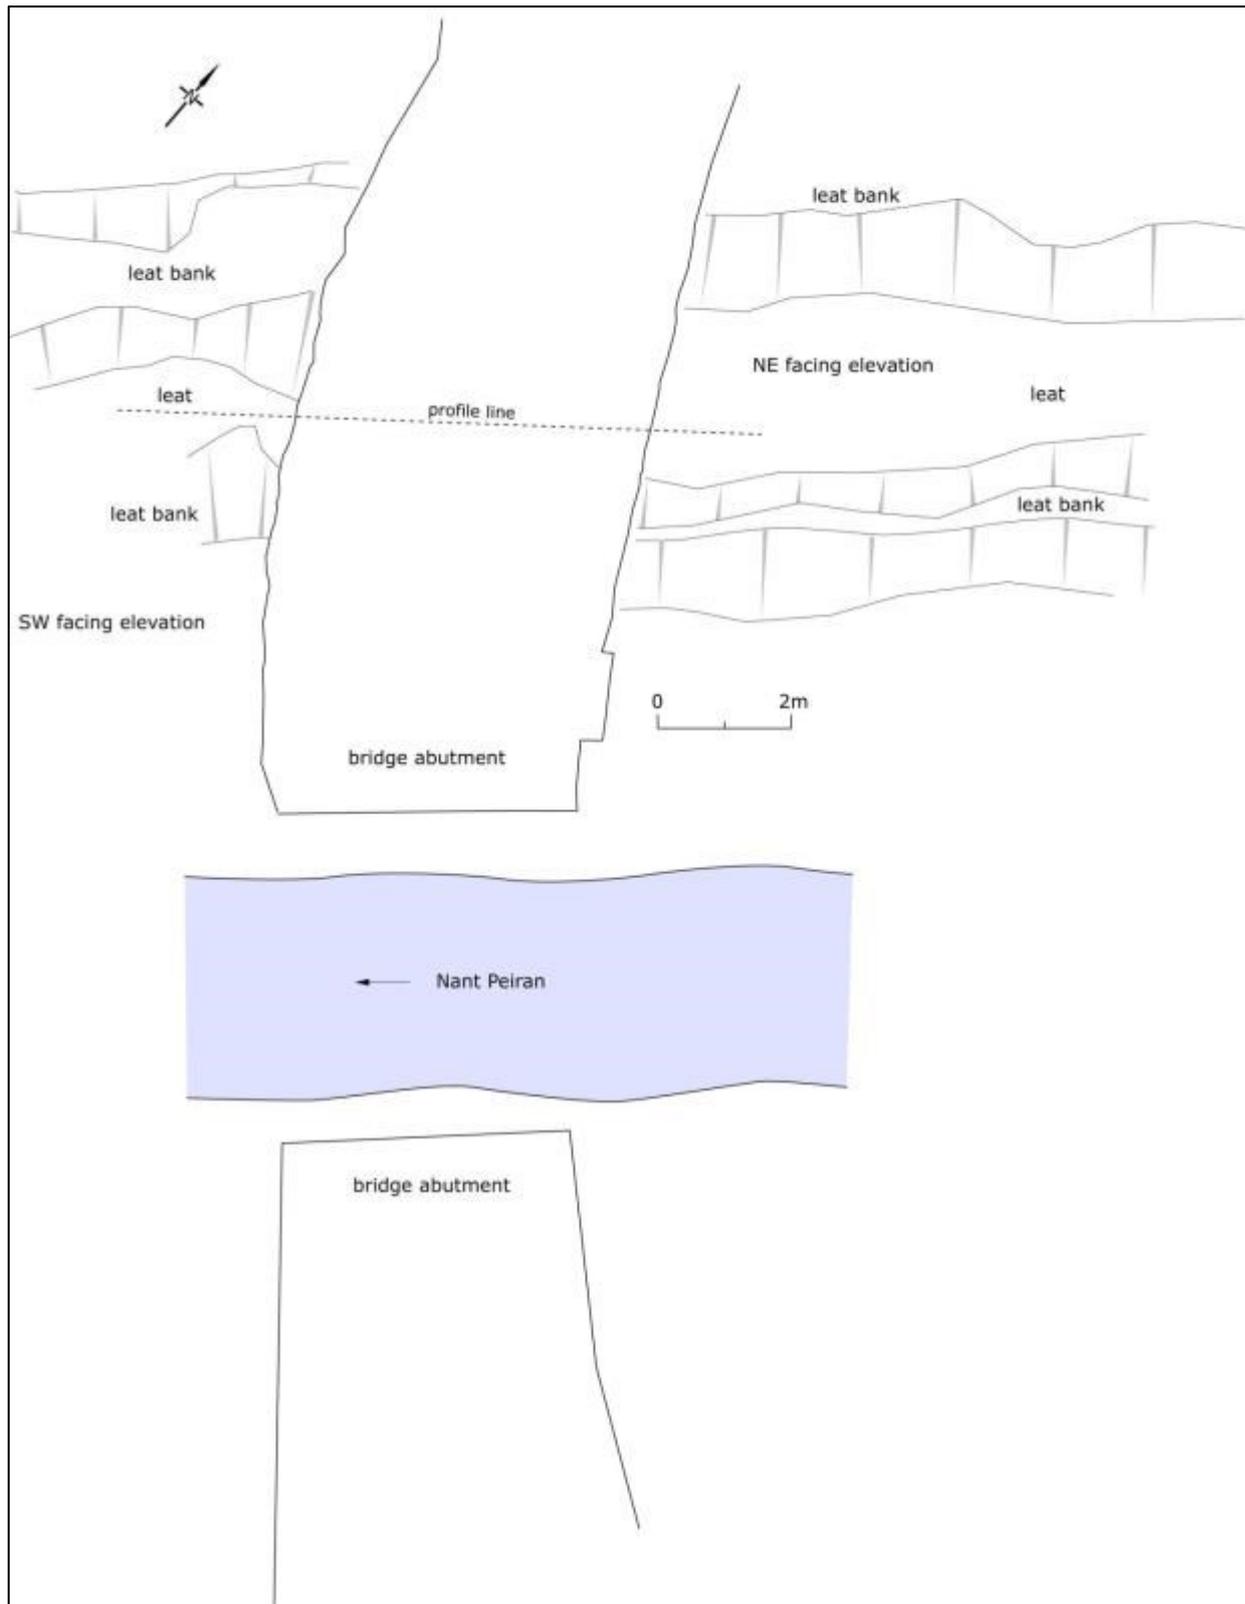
Plan drawing of the bridge abutments, and the leat in the vicinity of the northern bridge abutment where excavations were carried out. The profile is shown in Figure 9.
